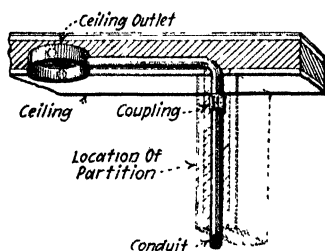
A piece of conduit cut to the proper length and threaded on both ends is coupled to the short conduit which projects from floor slab.
